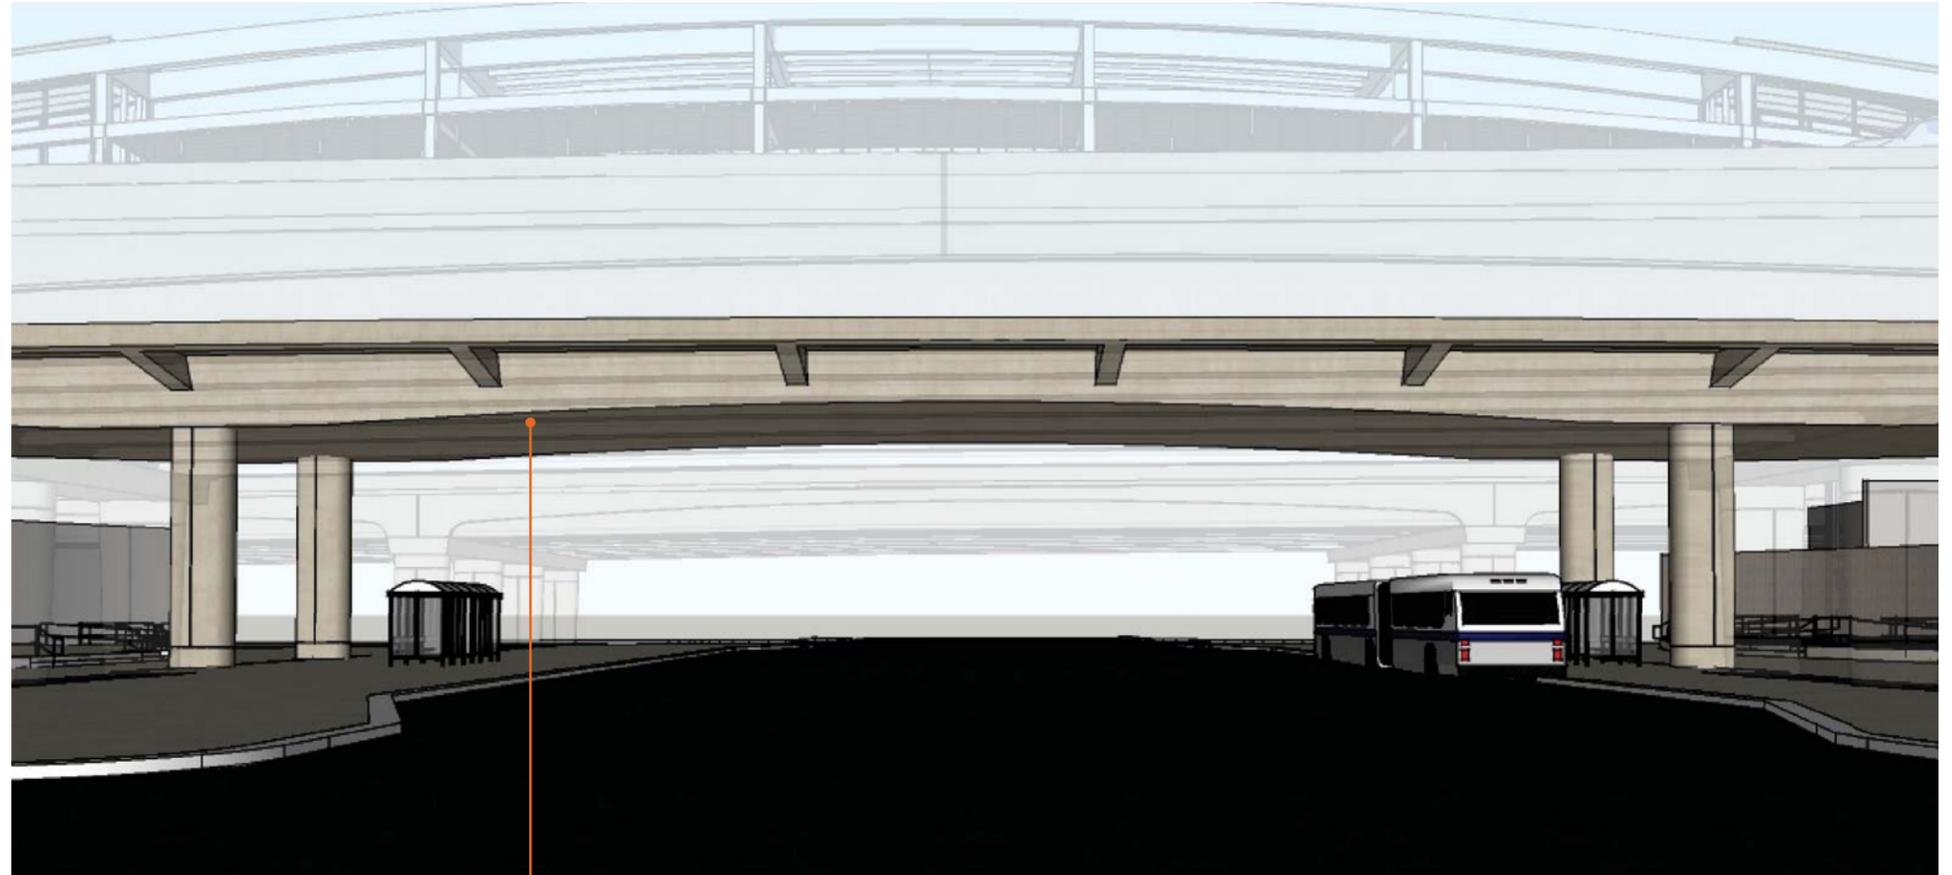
BRT Bridge Haunched Concrete Box
